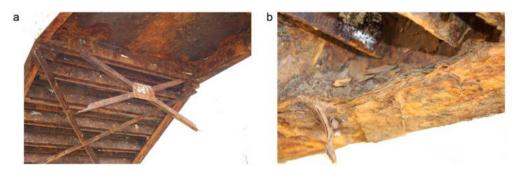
(a) corroded stairway steps and bracings, (b) bottom flange of stairway girder.
